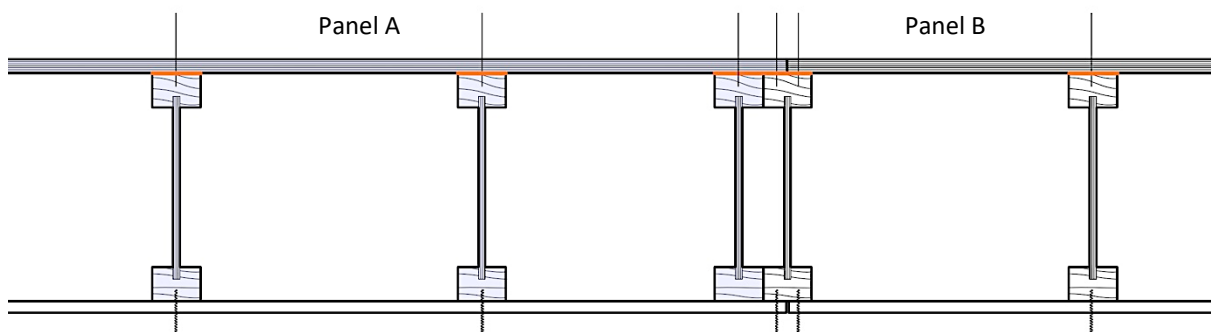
Floor panel to panel connection (red is glue line, OSB nailed to each joist)
